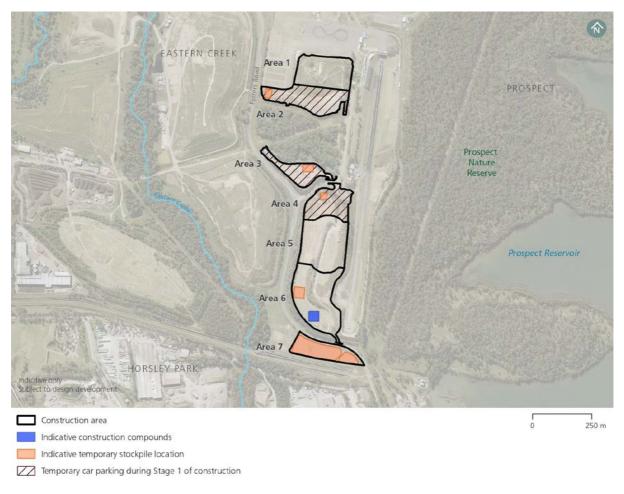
| Indicative construction layout and temporary Sydney Dragway parking (Source: Proponent's EIS)
